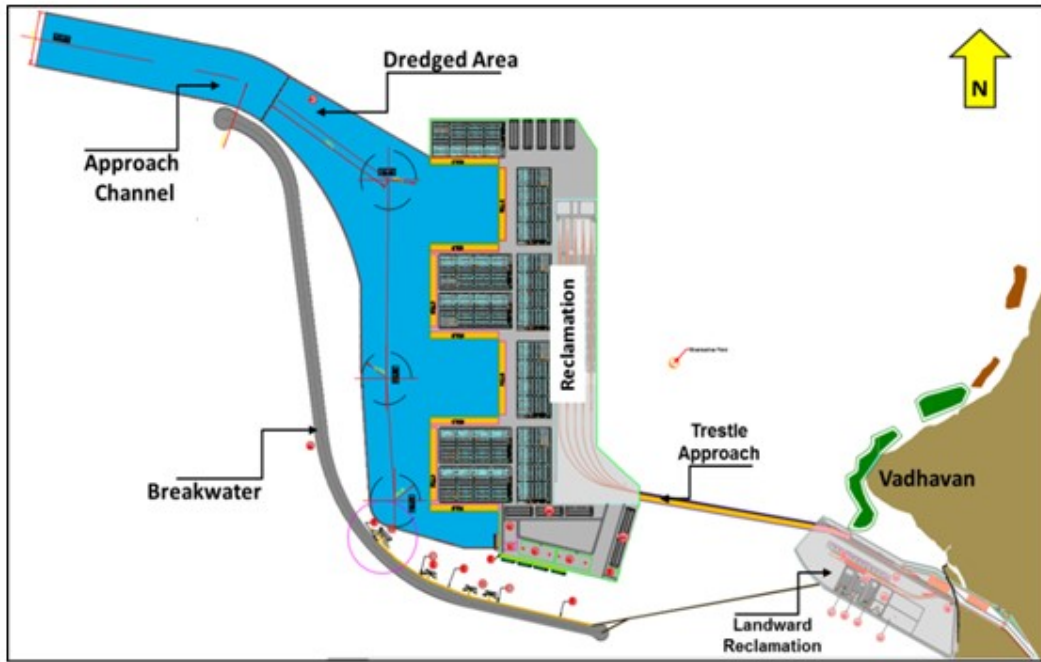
A: Proposed Final Modified Master Plan Layout at Vadhvan
